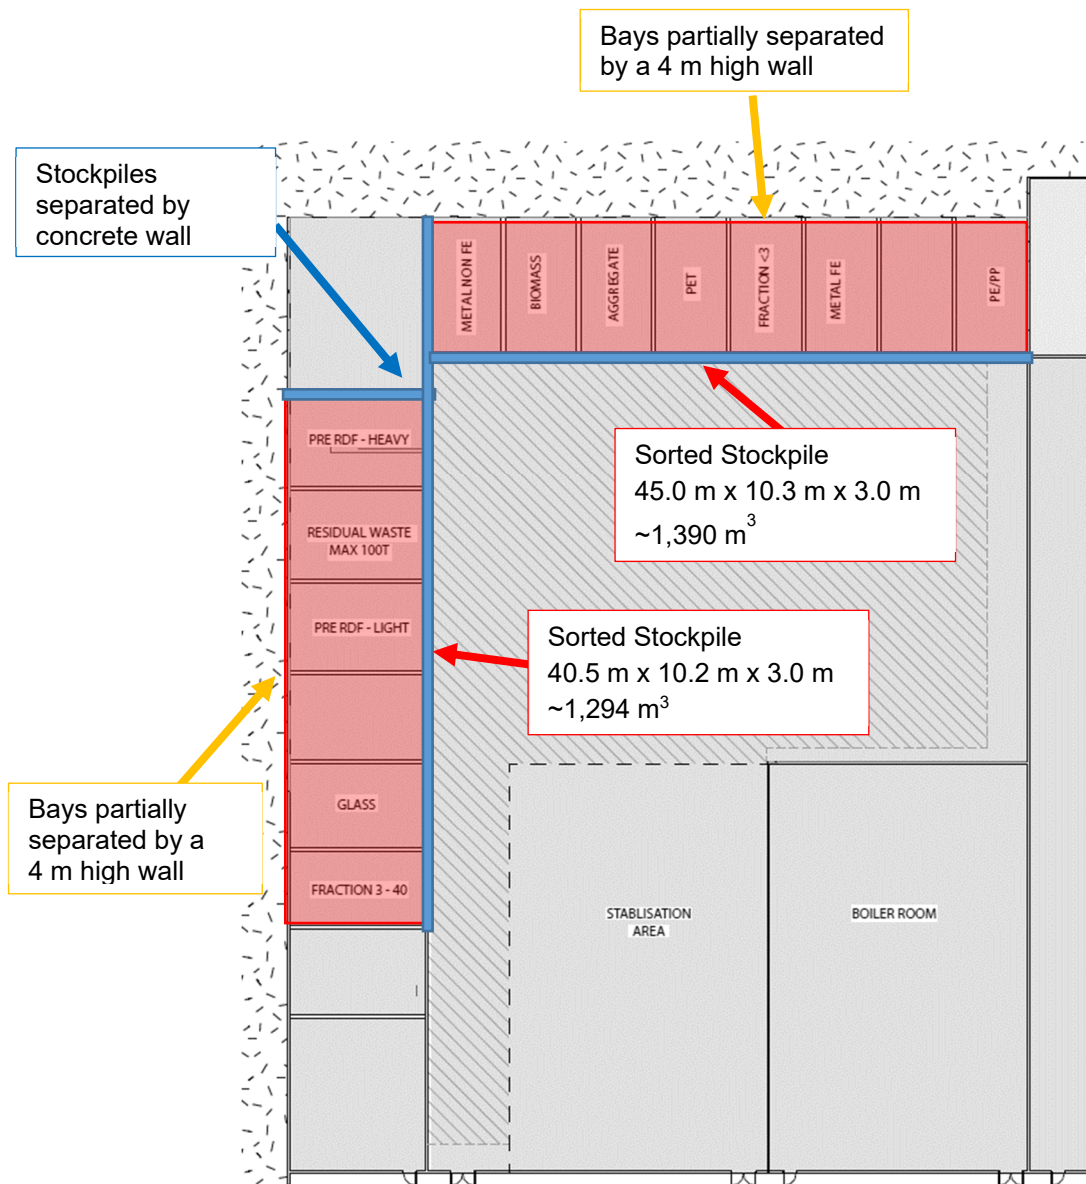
Proposed internal stockpile configuration for Waste Sorting Hall
